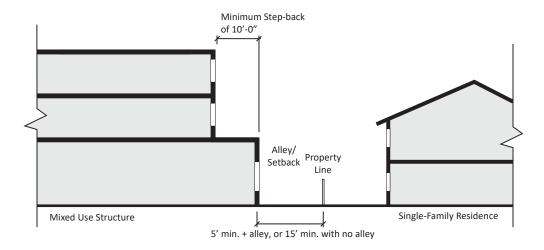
Building Height Step Back Adjacent to Residential Use or Zone
